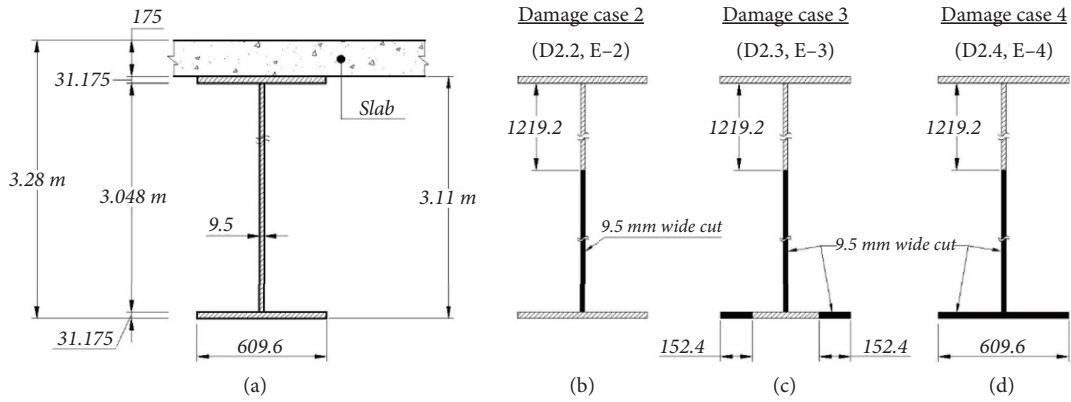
Cross section of the plate girder: (a) slab-on-girder section; (b–d) schematic of damage scenarios inflicted in steel girder (adapted from [41, 43], dimensions in mm).
